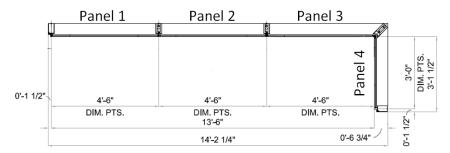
Plan view of three panels and a perpendicular panel of a 4SSG curtain wall system (recreated from drawing provided by Bagatelos Architectural Glass Systems Inc.)
